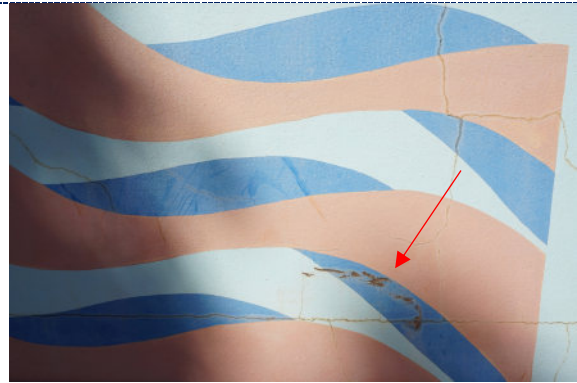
Detail – surface cracks and deformation to the mortar; chalking (UV degradation) and fading of the paint; staining to the exterior of the cracks; paint loss.
